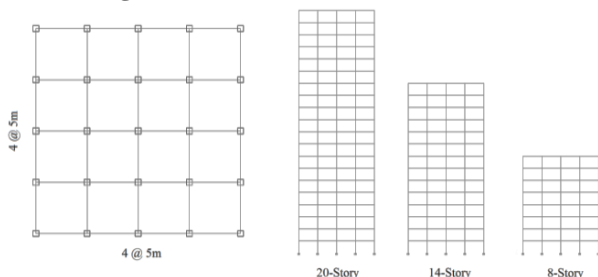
Schematic view of floor plan and elevation of the designed buildings
